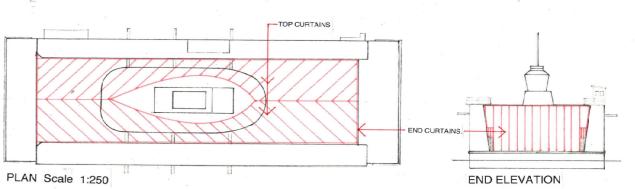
Sections, plan and elevation of a typical vessel (tug) docking plan with the acoustic curtains closed (shown in red) Source: William Loader Architectural and Marine Design, dated September 2019
